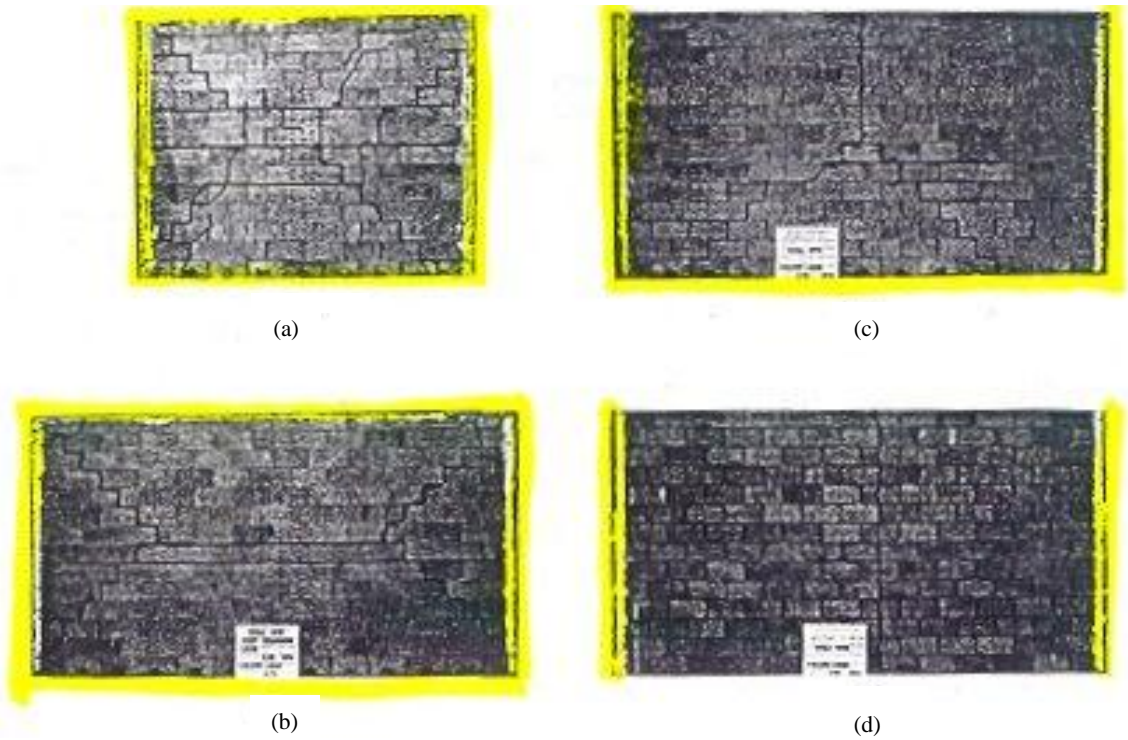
Typical Cracking Patterns for Various Wall Spans and Different Edge Support Conditions (Drysdale and Essawy, 1988).
